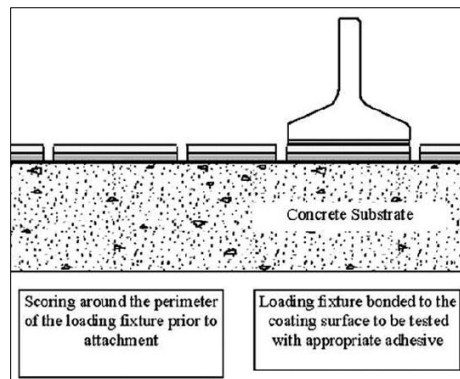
Tensile bond specimen layout, per ASTM D7234
